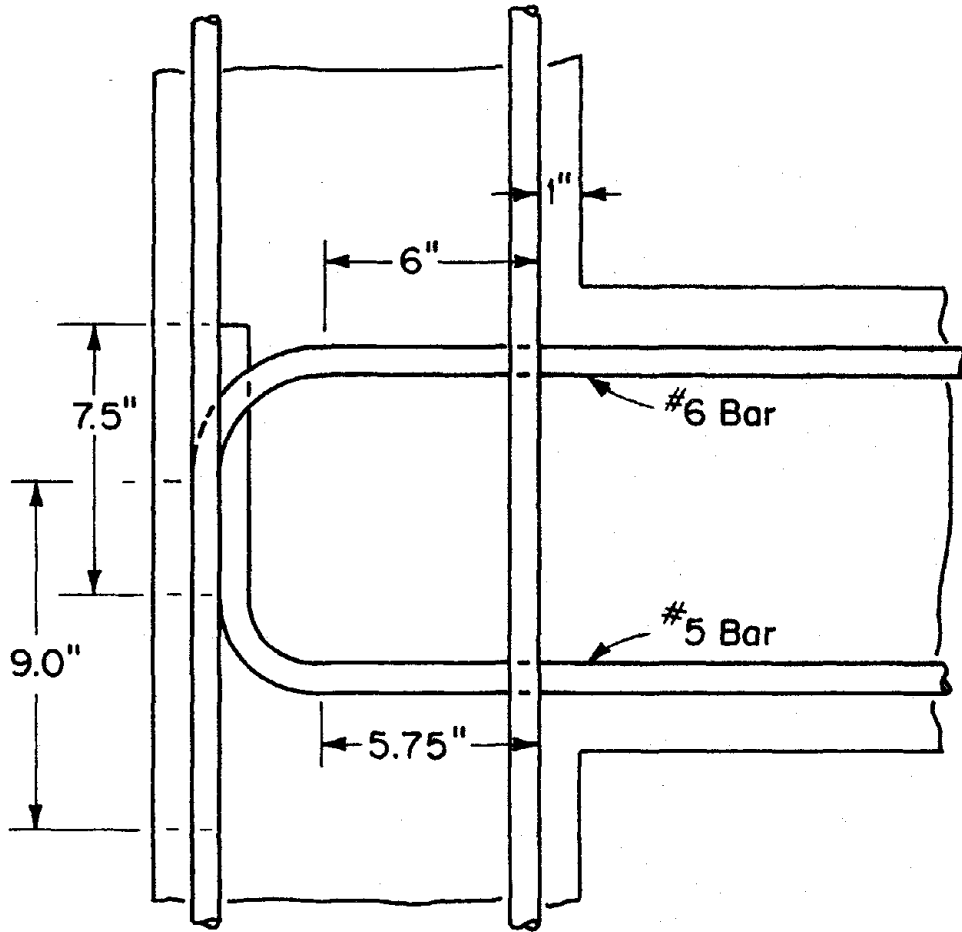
Details of Reinforcement Anchorage - Group I Specimens.
